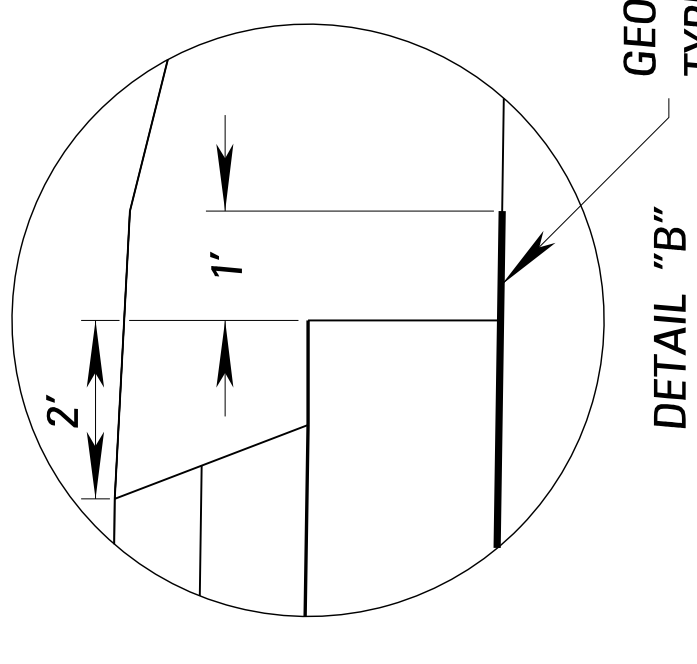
DETAIL OF PAVED SHOULDERS AT BRIDGE ENDS
